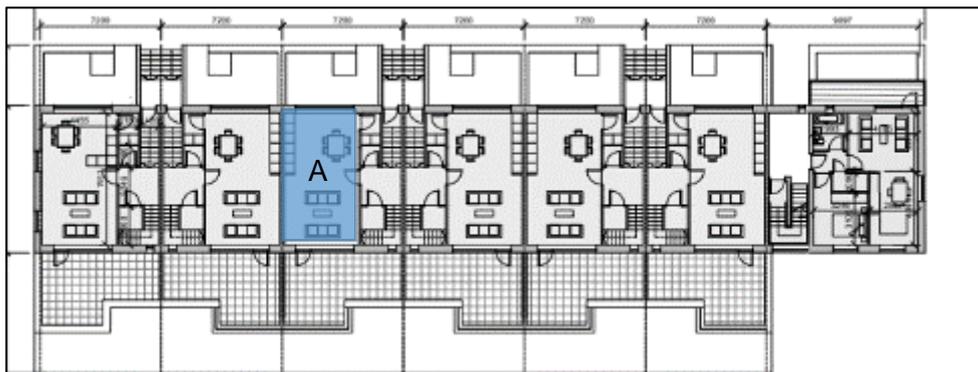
Block C1 – First Floor Assessed Rooms Highlighted in Blue
